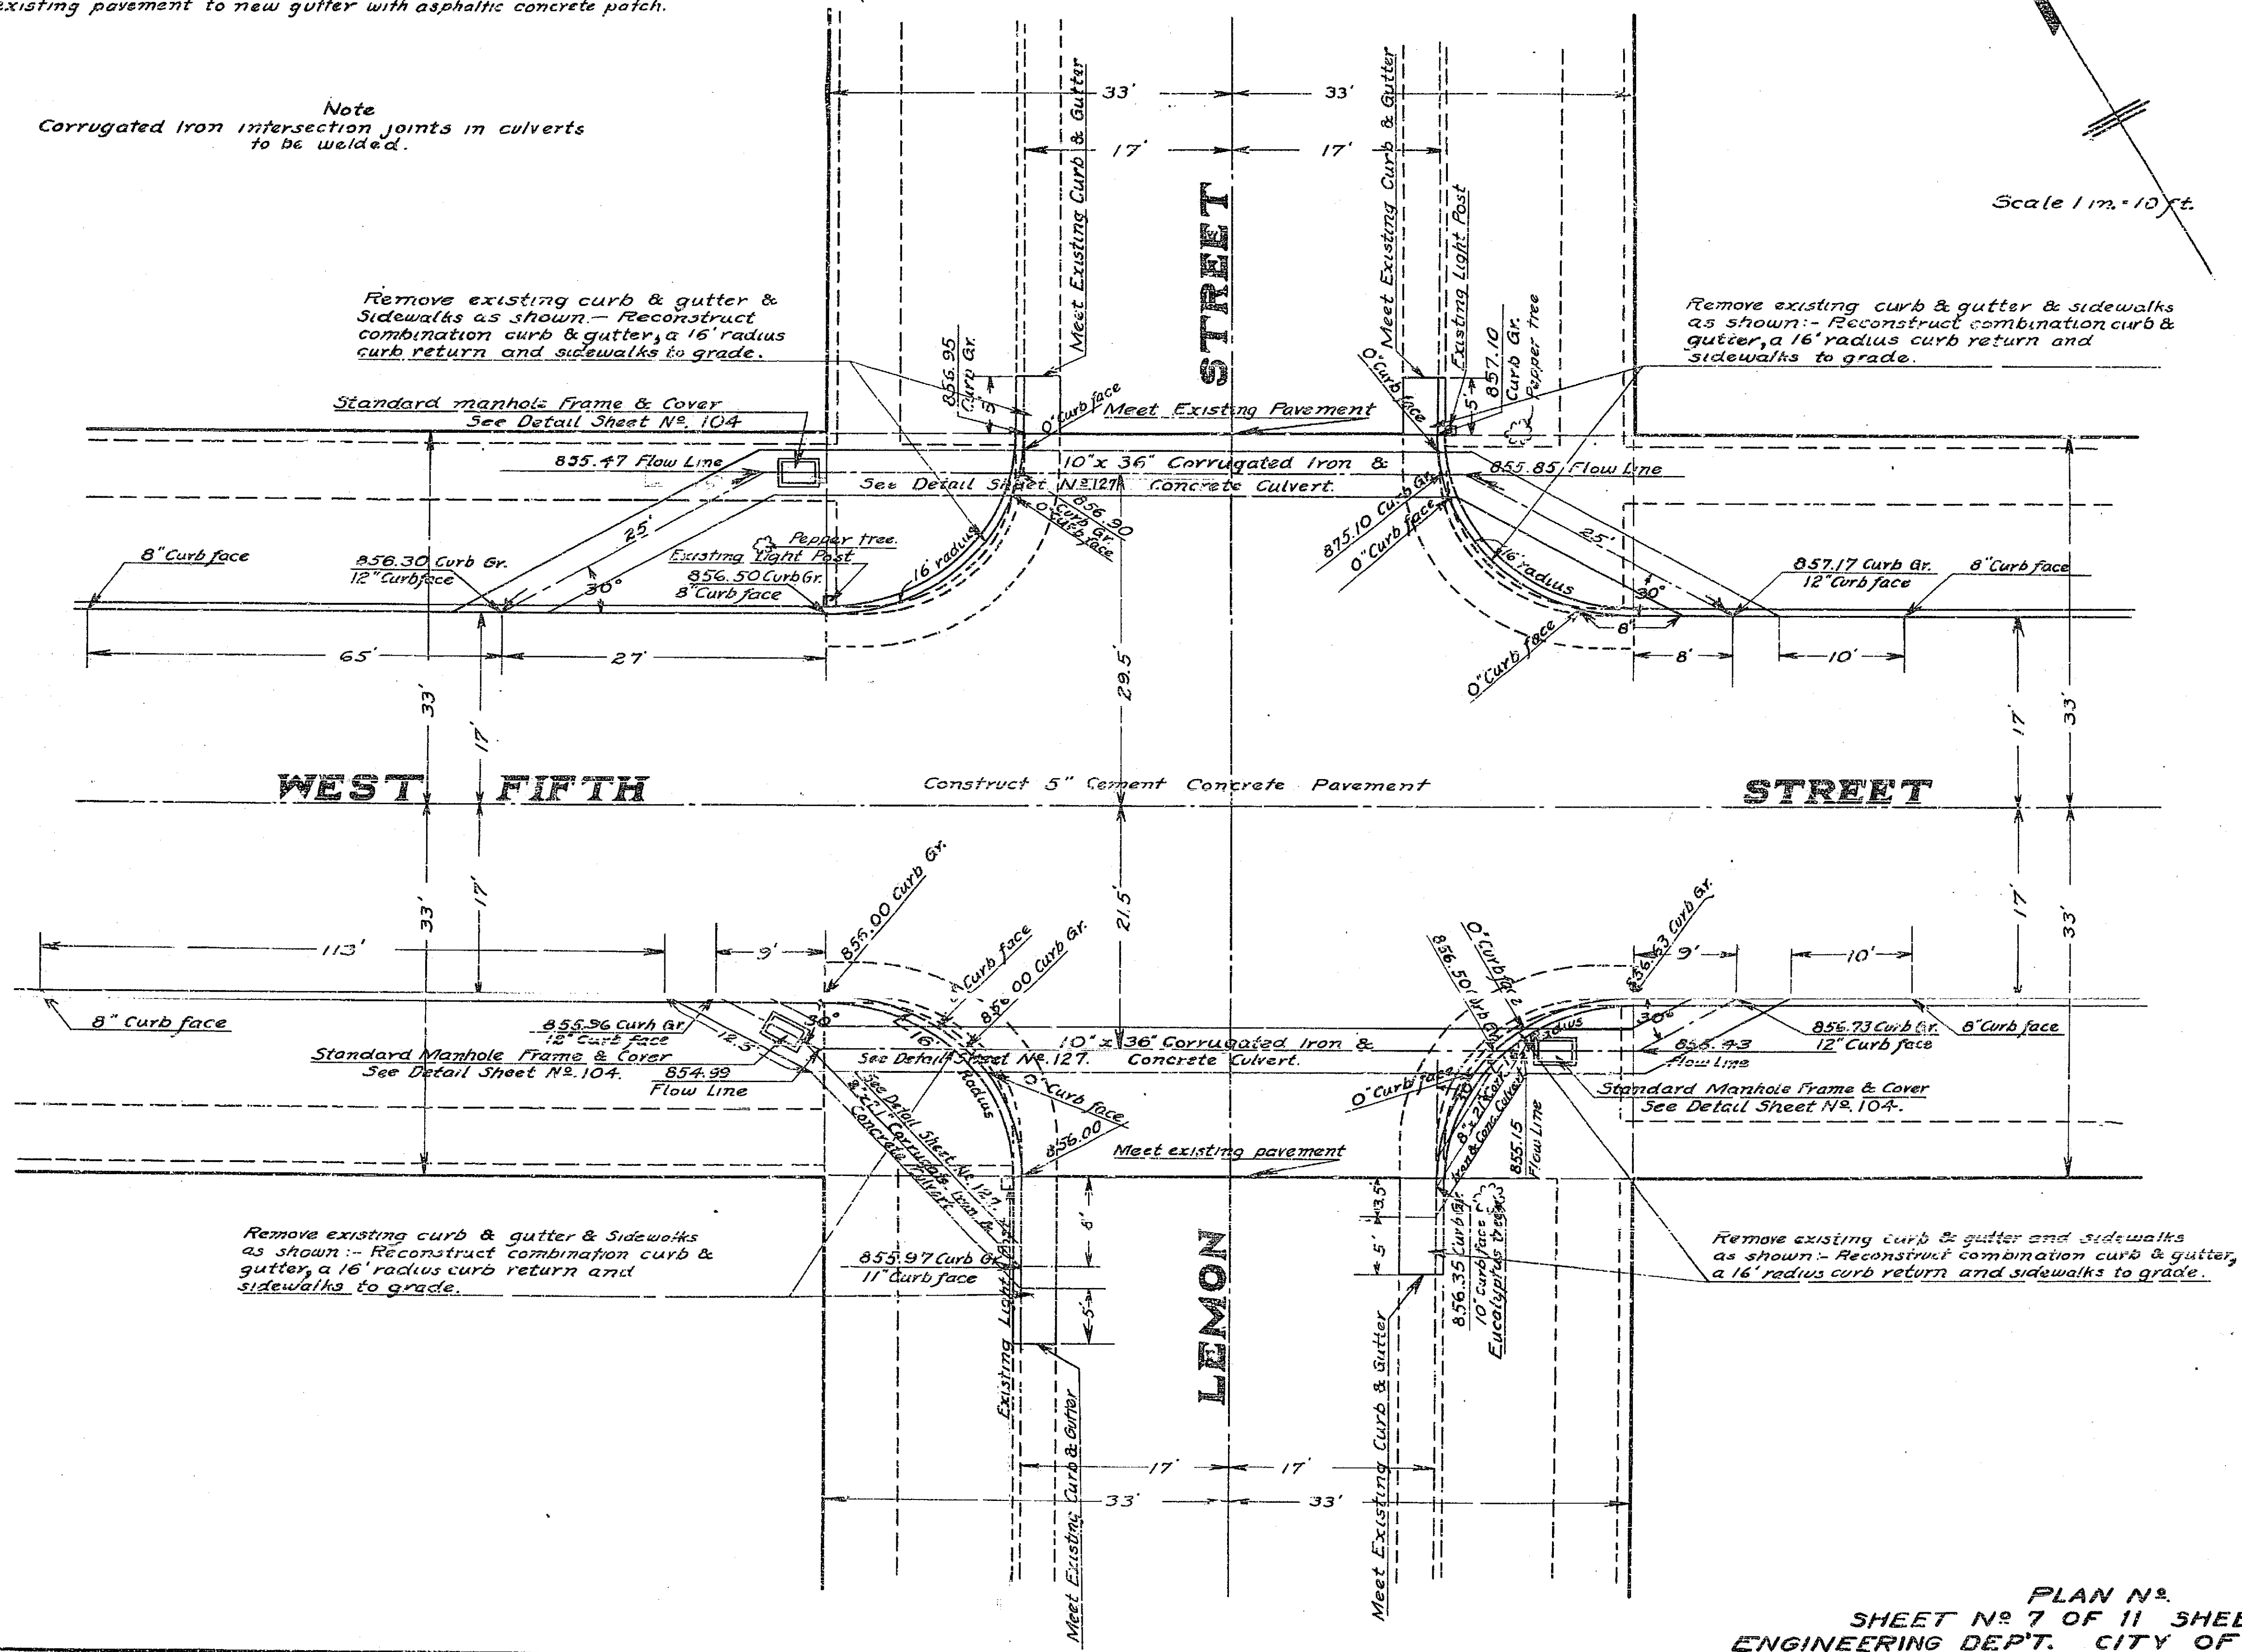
# DETAILS OF INTERSECTION OF WEST FIFTH STREET AND LEMON STREET
